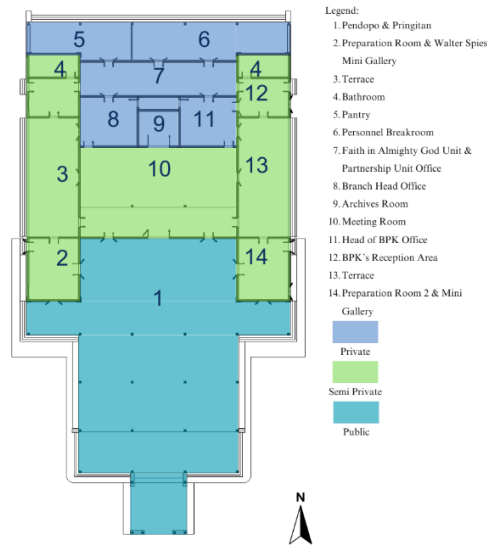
The draft of the new floor plan of Dalem Jayadipuran
